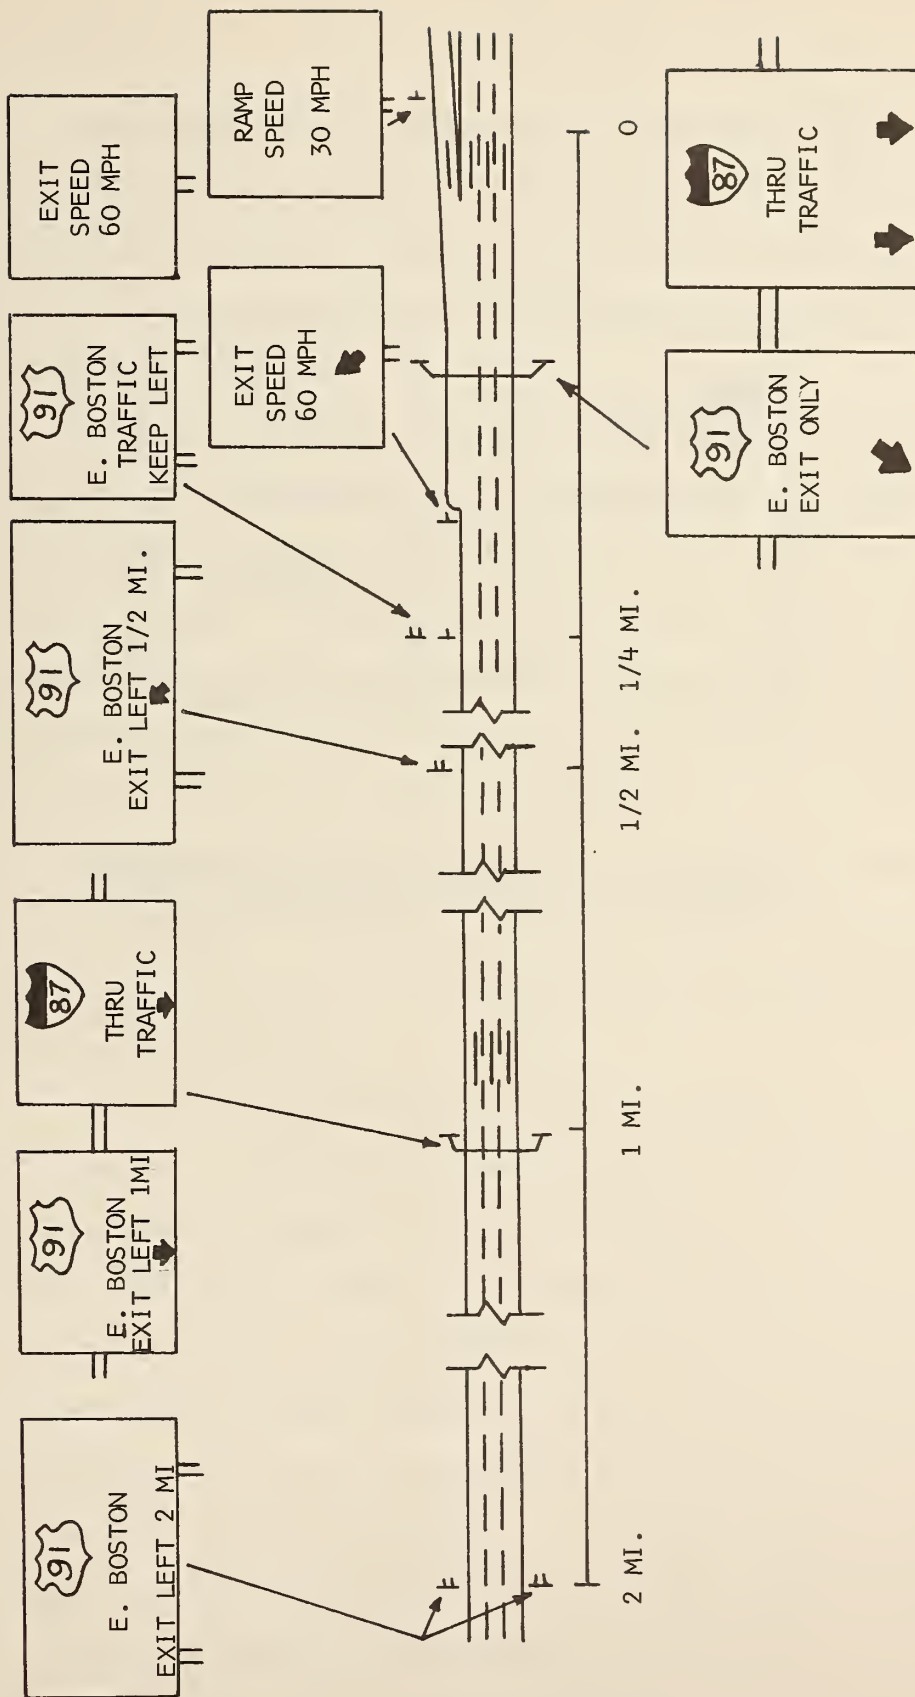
Suggested Signing Plan for Left-Hand Exits
